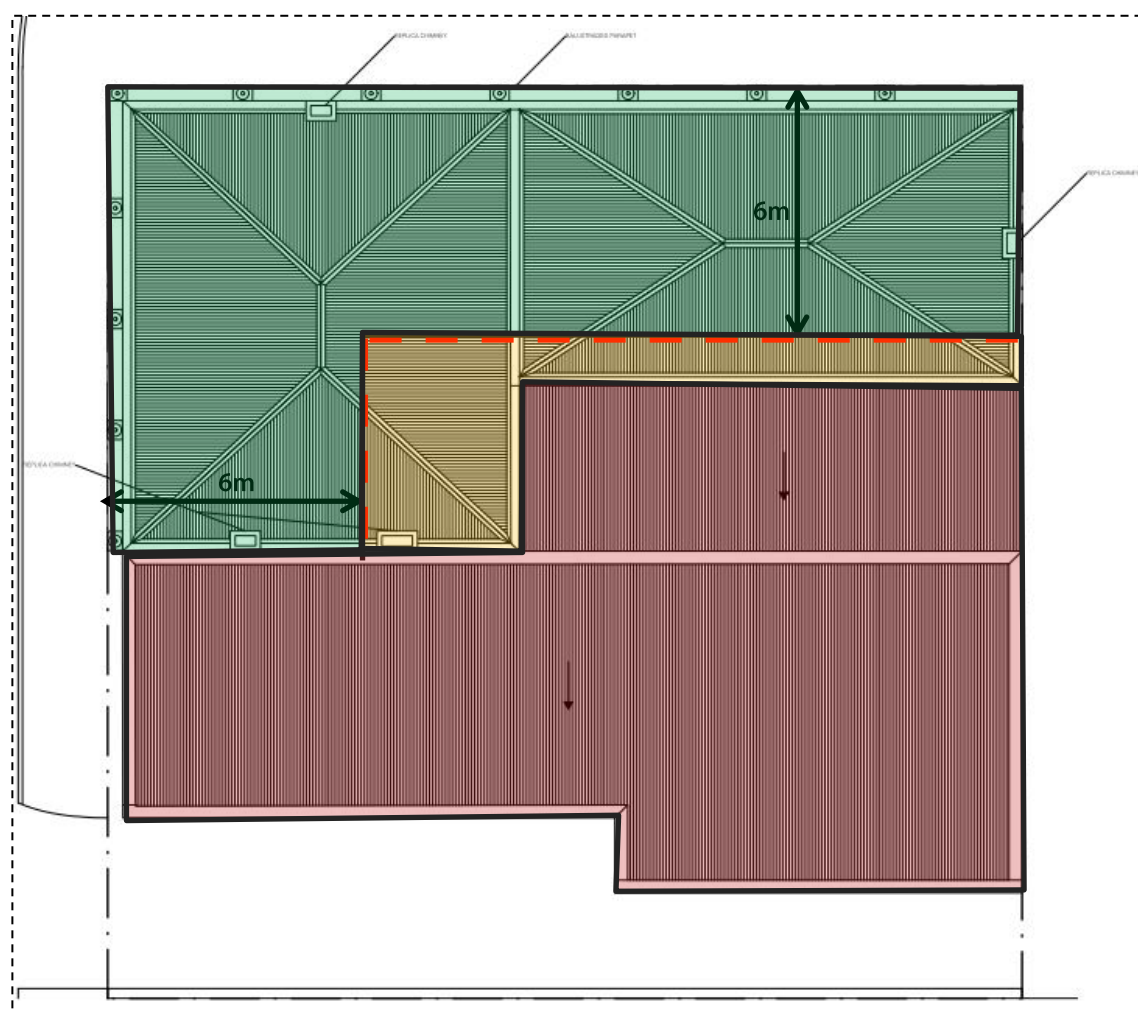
Roof plan of former hotel (Source:WBa). Red dashed lines, colour and dimensions added by Tract.
